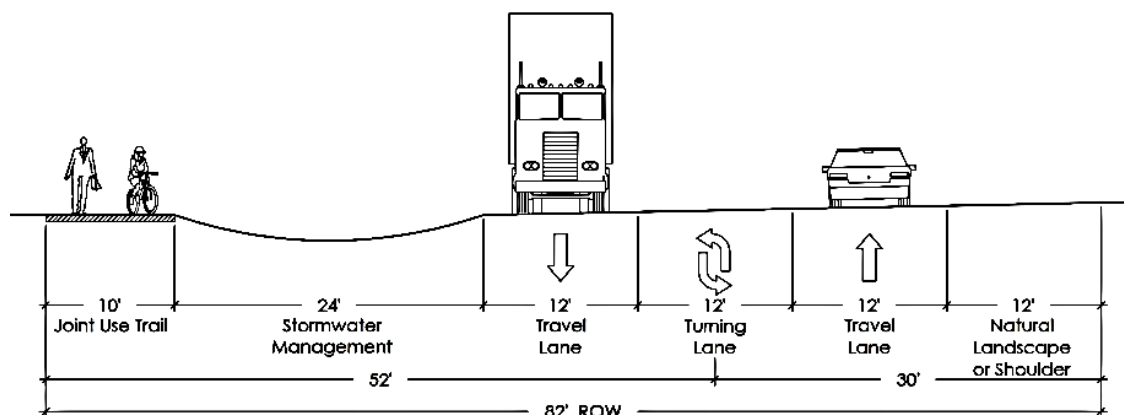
Bell Road (looking north) Cross Section between Fink Road and W. Ike Crow Road
